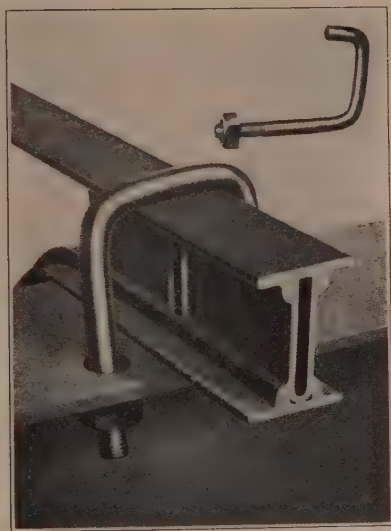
ANCHORAGE FOR STEEL JOISTS
